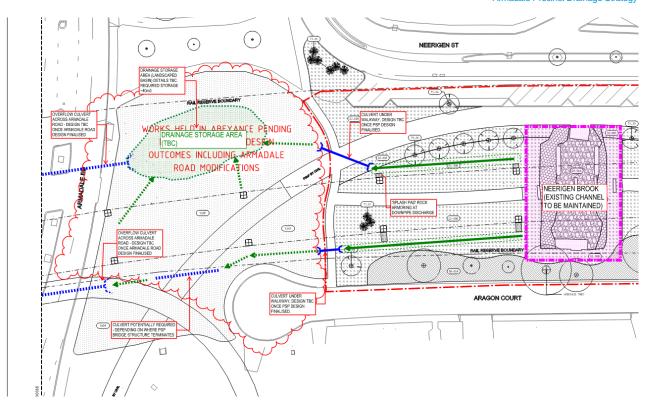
Drainage Scheme between Armadale Road and Neerigen Brook
